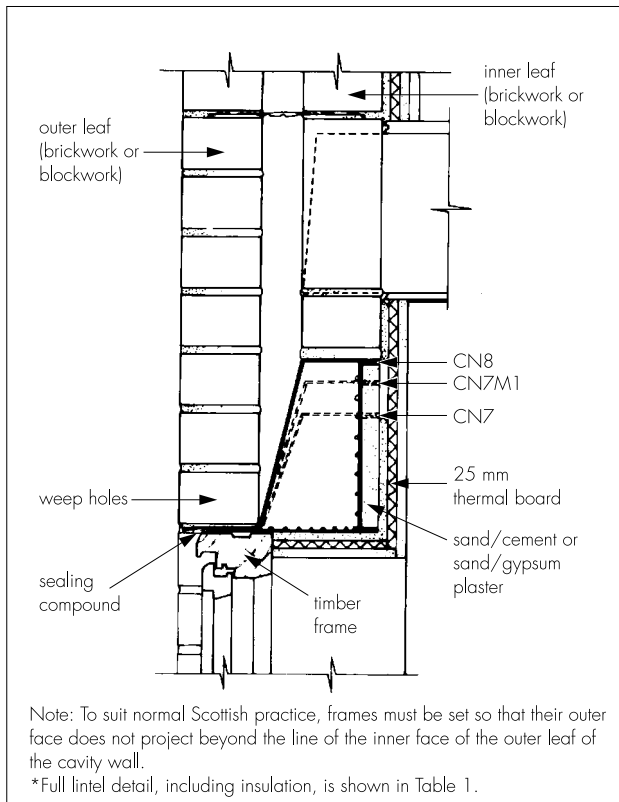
Typical installation details for Cougar rebated lintels (types CGR)
